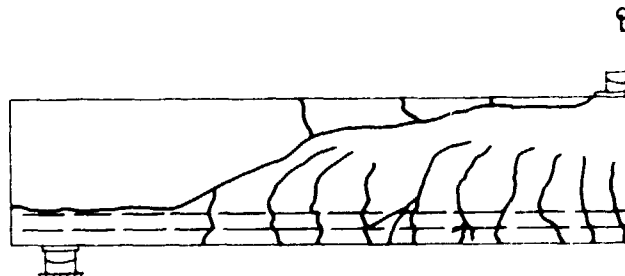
Observed cracking after failure of the OA-2 beam.
